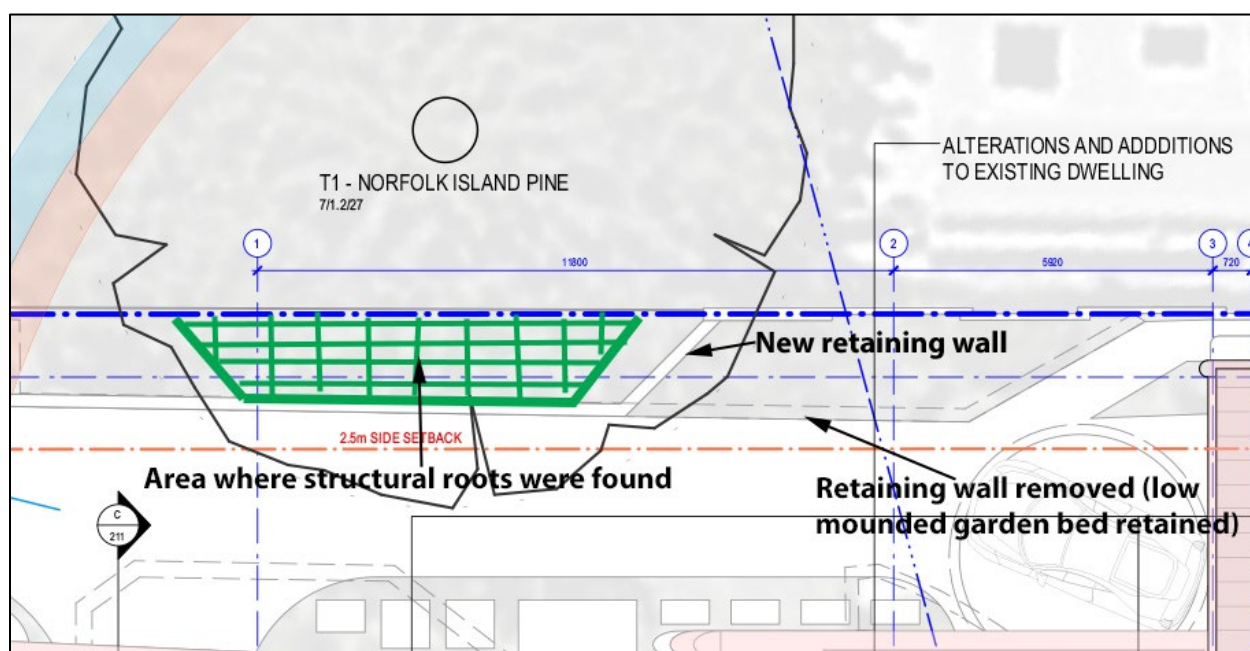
Figure D: Garden bed retaining wall works are outside of the area where large structural roots were found.
